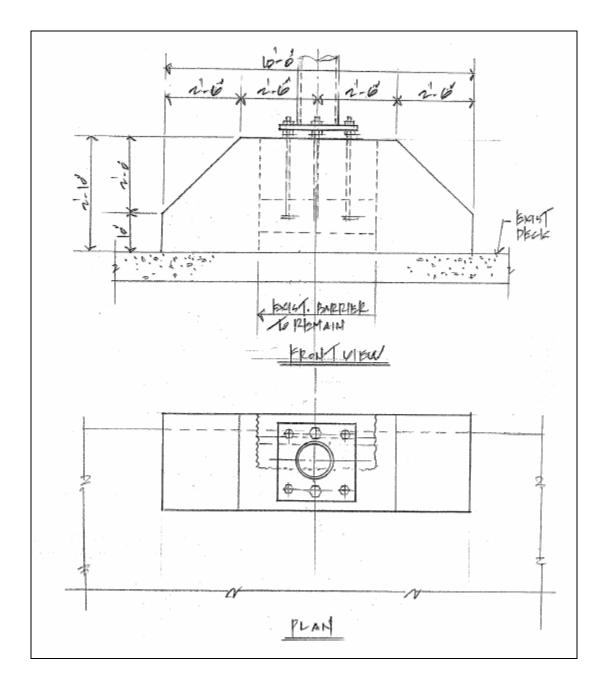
An OCS Anchor Block Design by INCA [5] Analyzed in This Study – Front View and Plan View
